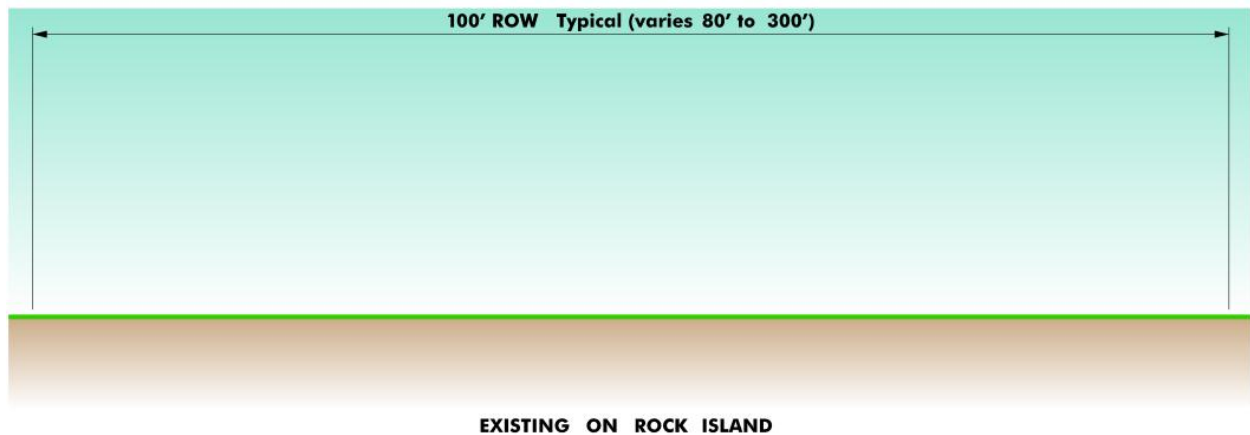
Enhanced Streetcar Typical Section - Rock Island Railroad Existing Conditions
